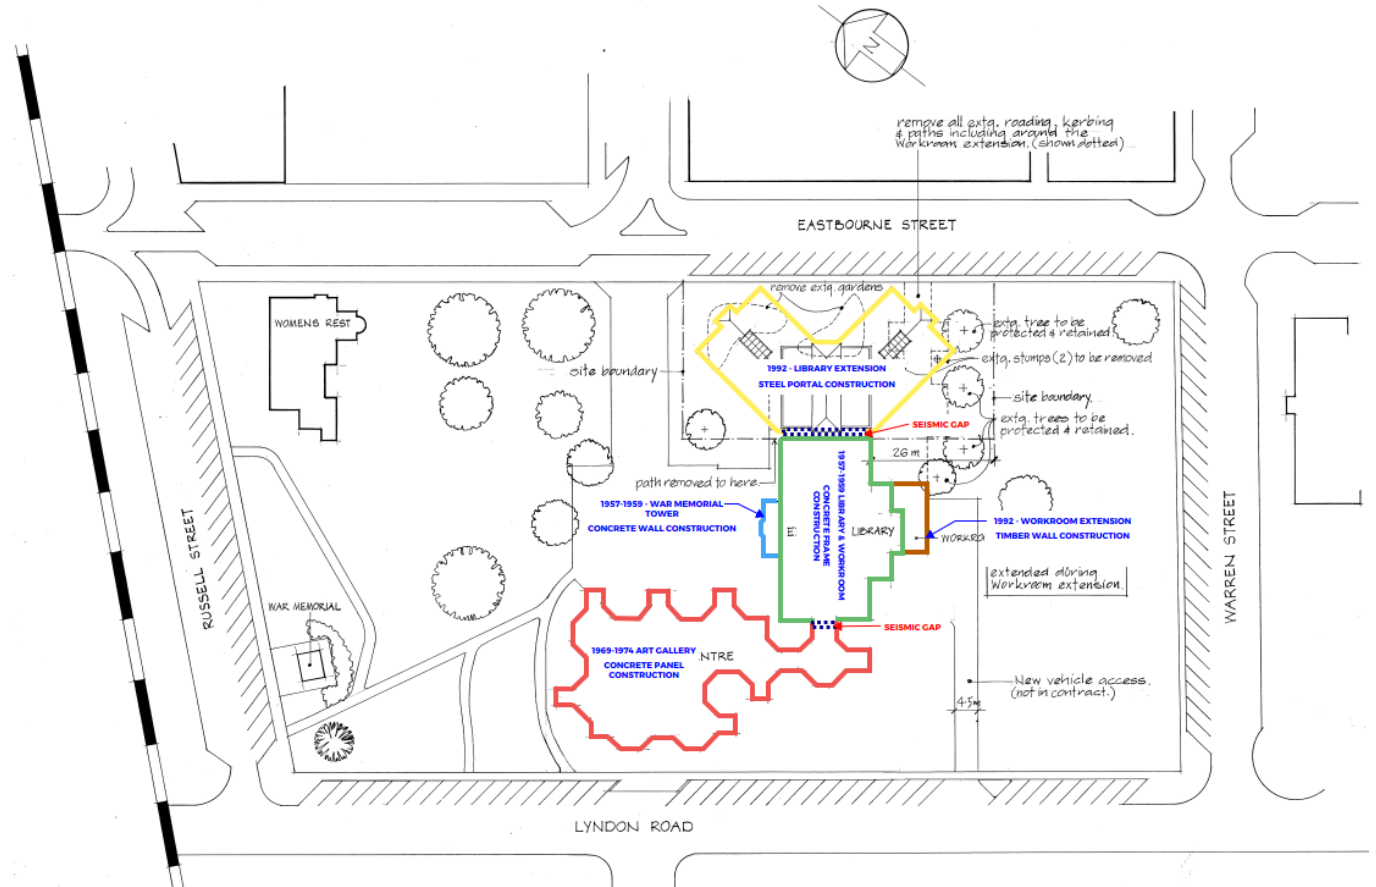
Site Plan Shown Different Construction Stages of Hastings Library - Courtesy of Works Consultancy Services Ltd drawing, Sheet No. 101, Job No, 3/177/5.
